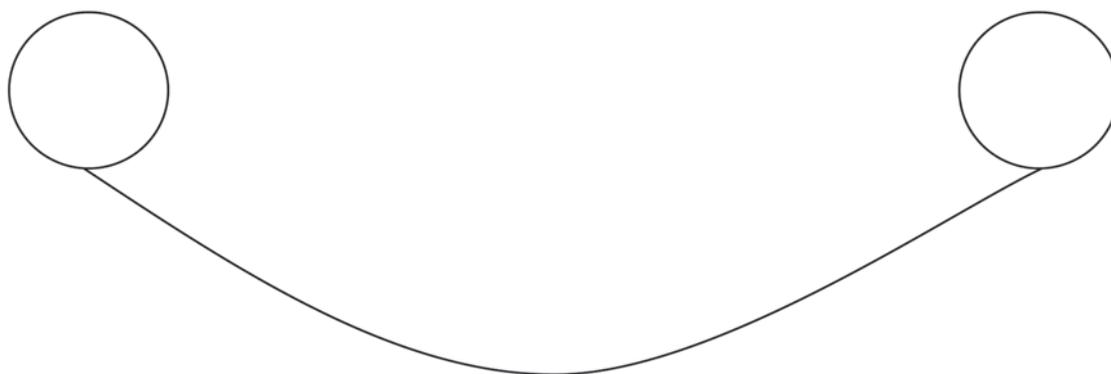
Schematic plan of a section of wall between two projecting towers.
